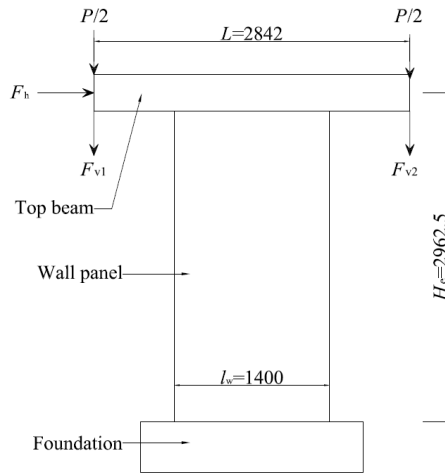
Loading condition applied to the test wall model (dimensions in mm)
